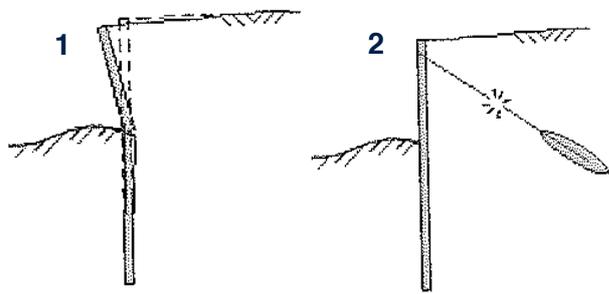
visualisation of the structural failure mechanism (SBRCURnet, 2014)
